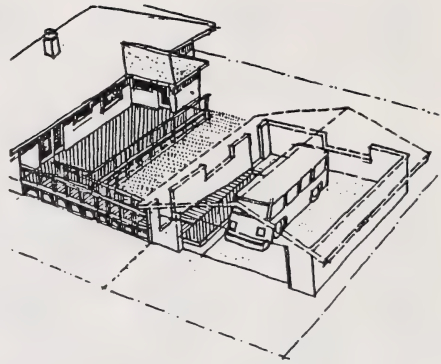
CONNECTING THE DECK TO AN ARRIVAL PLATFORM IN A GARAGE
